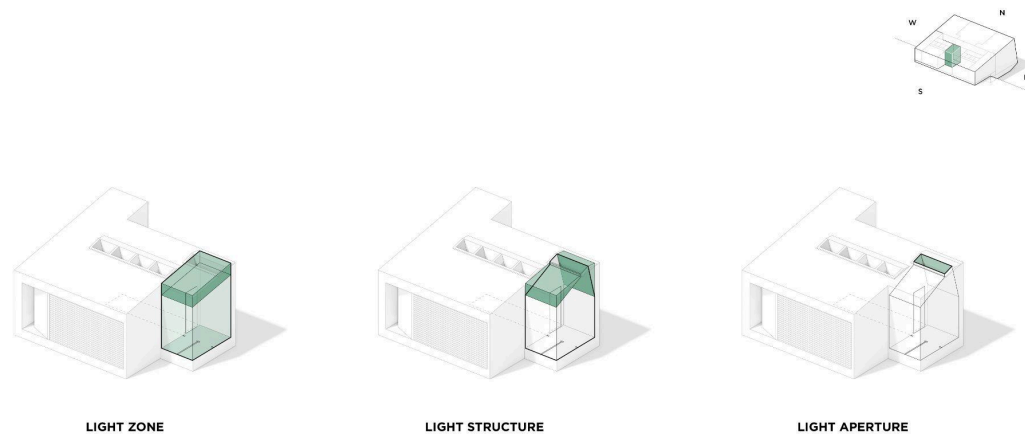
Changing Rooms, Bathrooms: Design Strategy
